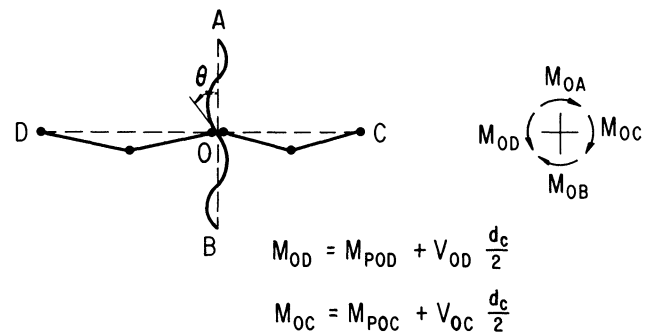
Girder-and-column system assumed in design of columns for full loading
